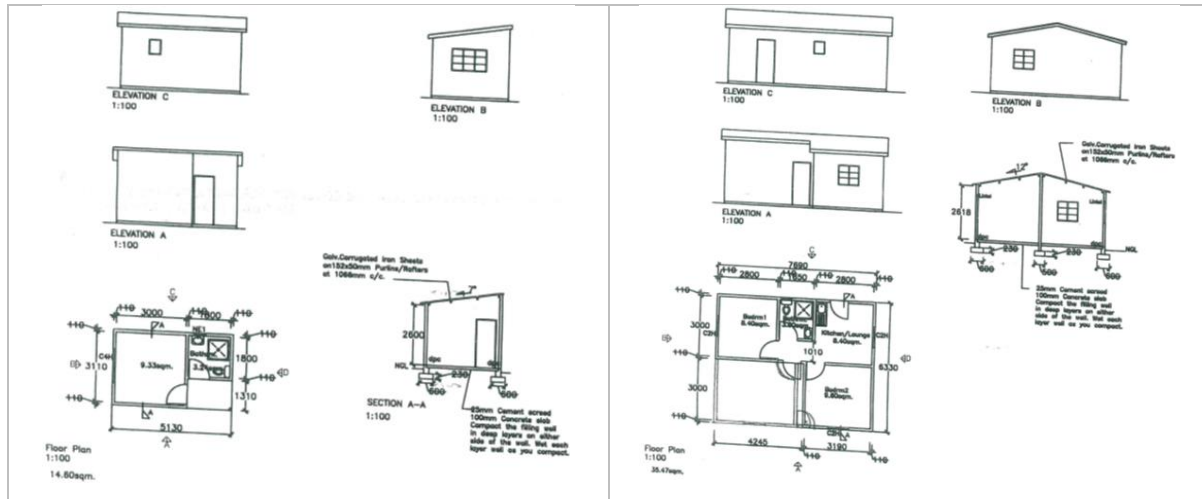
Examples of building plans for Built Together houses. The illustration to the left is a 14.6 m² one bedroom house with bathroom. To the right is illustrated a 35.5m² house with two bedrooms, kitchen and bathroom.
